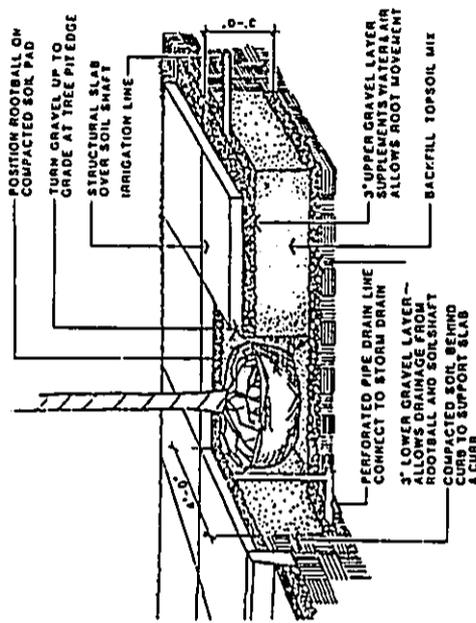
Vault systems can provide high quality root space underneath pavements. (Drawing courtesy of J. Urban)
